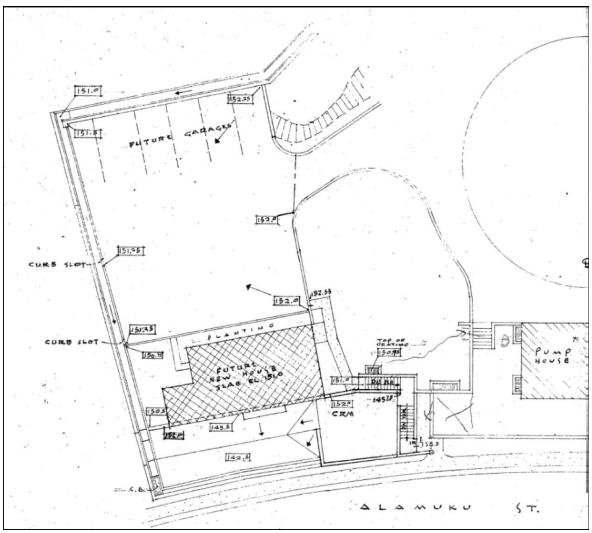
Hart Wood's Revised Partial Plot Plan showing proposed uses for the area proposed for the new reservoir as "future garages" and "future new house". (Proposed reservoir location added by author.) Drawing dated 2/12/1952.
